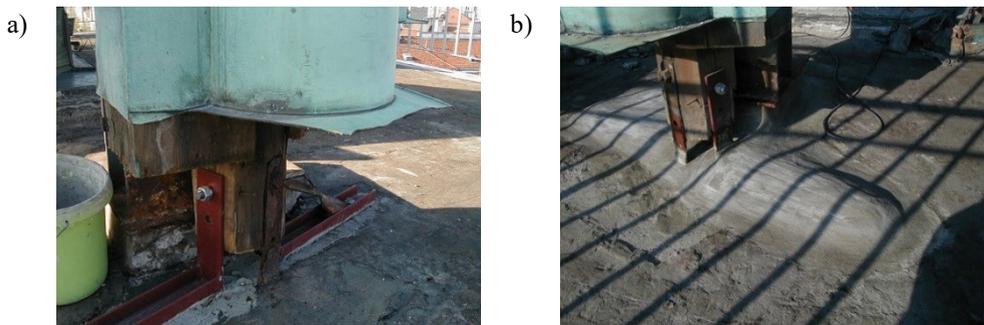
Designed foundation for gloriette pillars, a) steel anchors, b) protection of the anchor with the airtight concrete.
